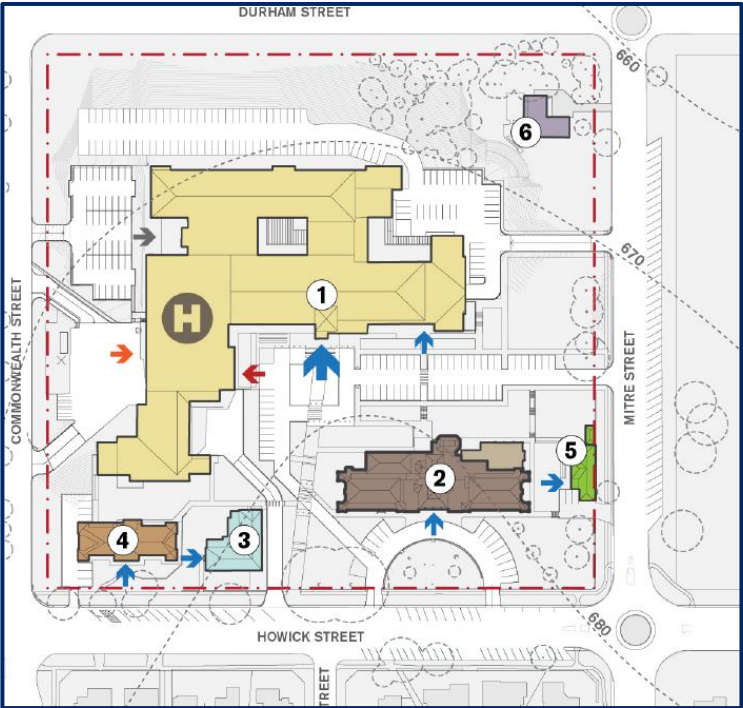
Hospital site plan (courtesy: Billard Leece Partnership, 2024)
